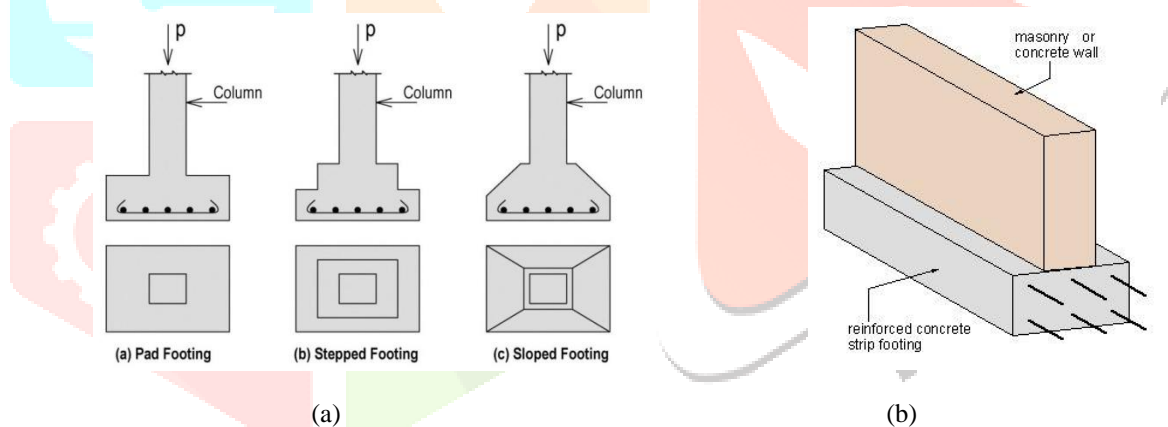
(a) Types of Isolated Footing (b) Wall Footing or Strip footing
